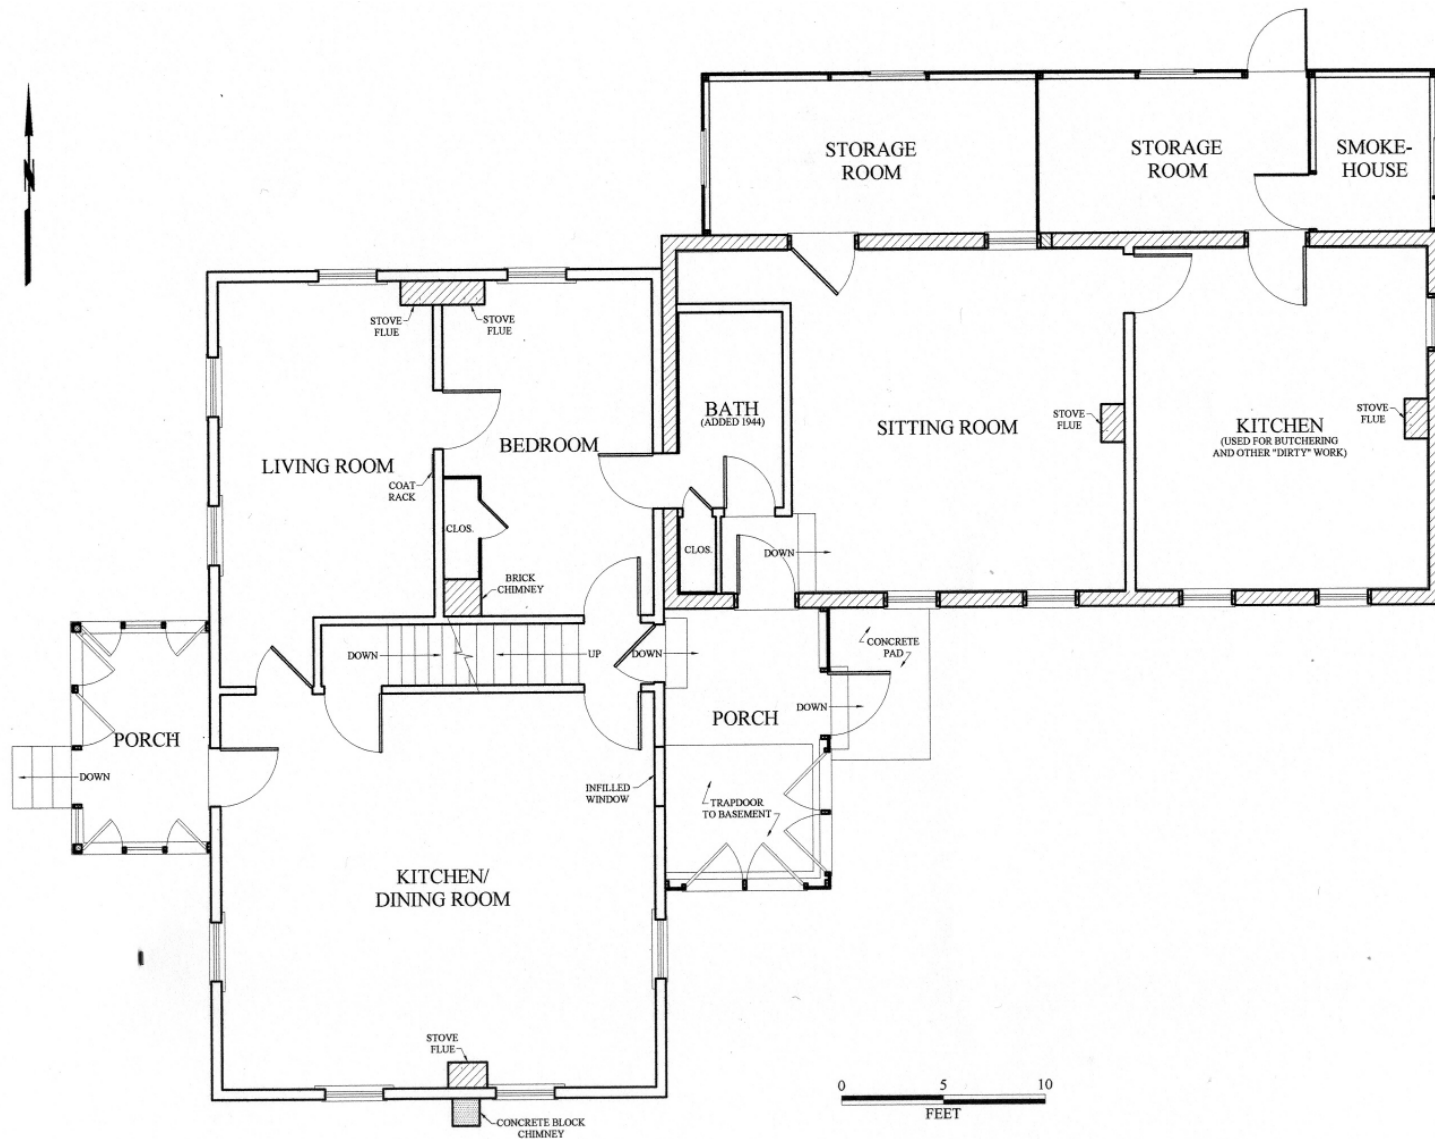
Existing first story floor plan of the Roman-Seibert House, 2010. This farmhouse was last occupied by the Widicus family during the 1950s.
